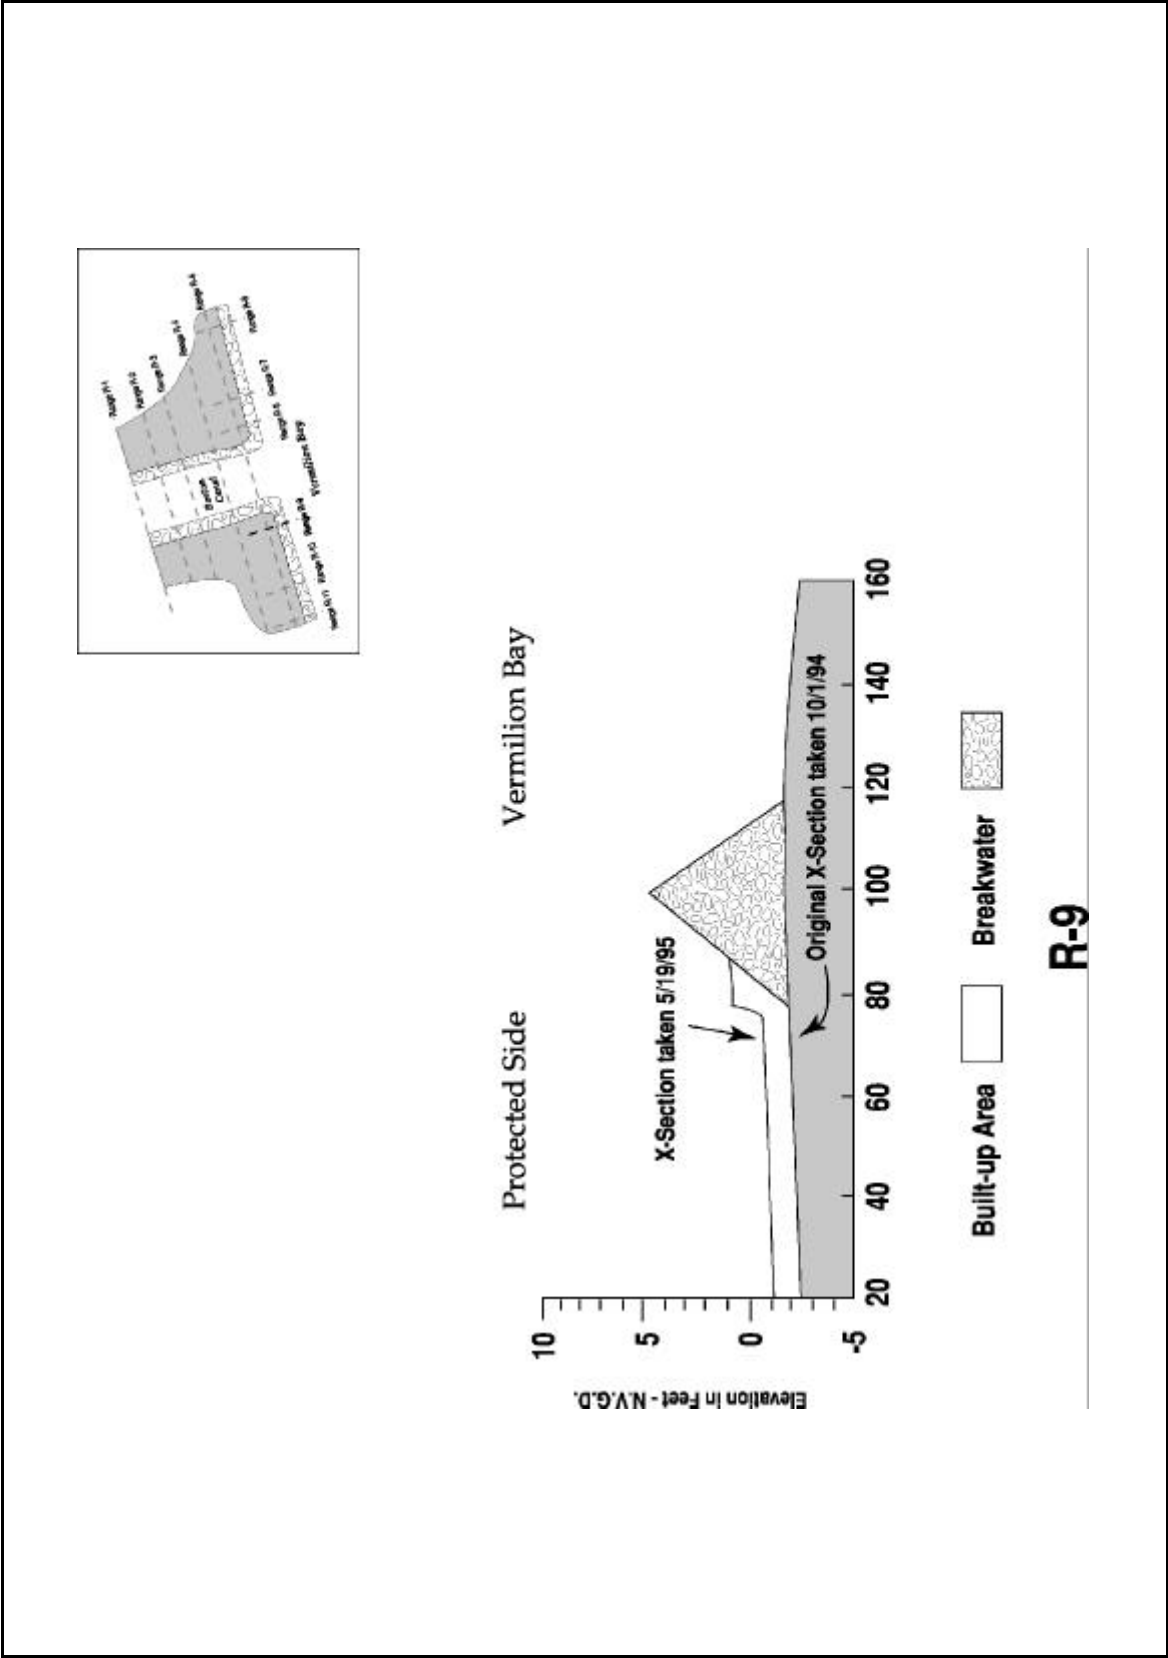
Boston Canal/Vermilion Bay Shoreline Protection (T/V-09) elevational profile of north-south transect R-9 showing accretion.
